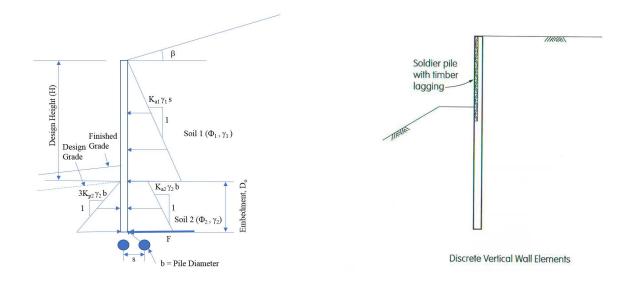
Typical Non-Gravity Cantilever ERS with Discrete Vertical Wall Elements Embedded in Granular Soils (Modified after AASHTO LRFD BDS, 2012 and Caltrans BDS, 2004)
